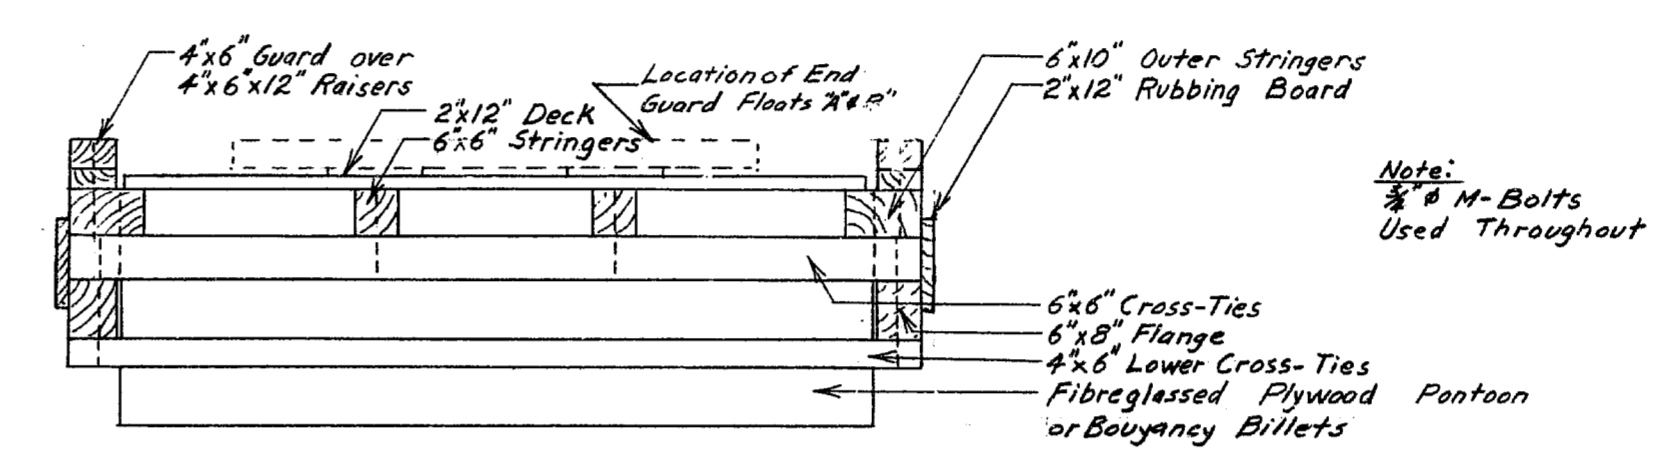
TYPICAL FLOAT SECTION Scale: 1/8"=1'-0"
